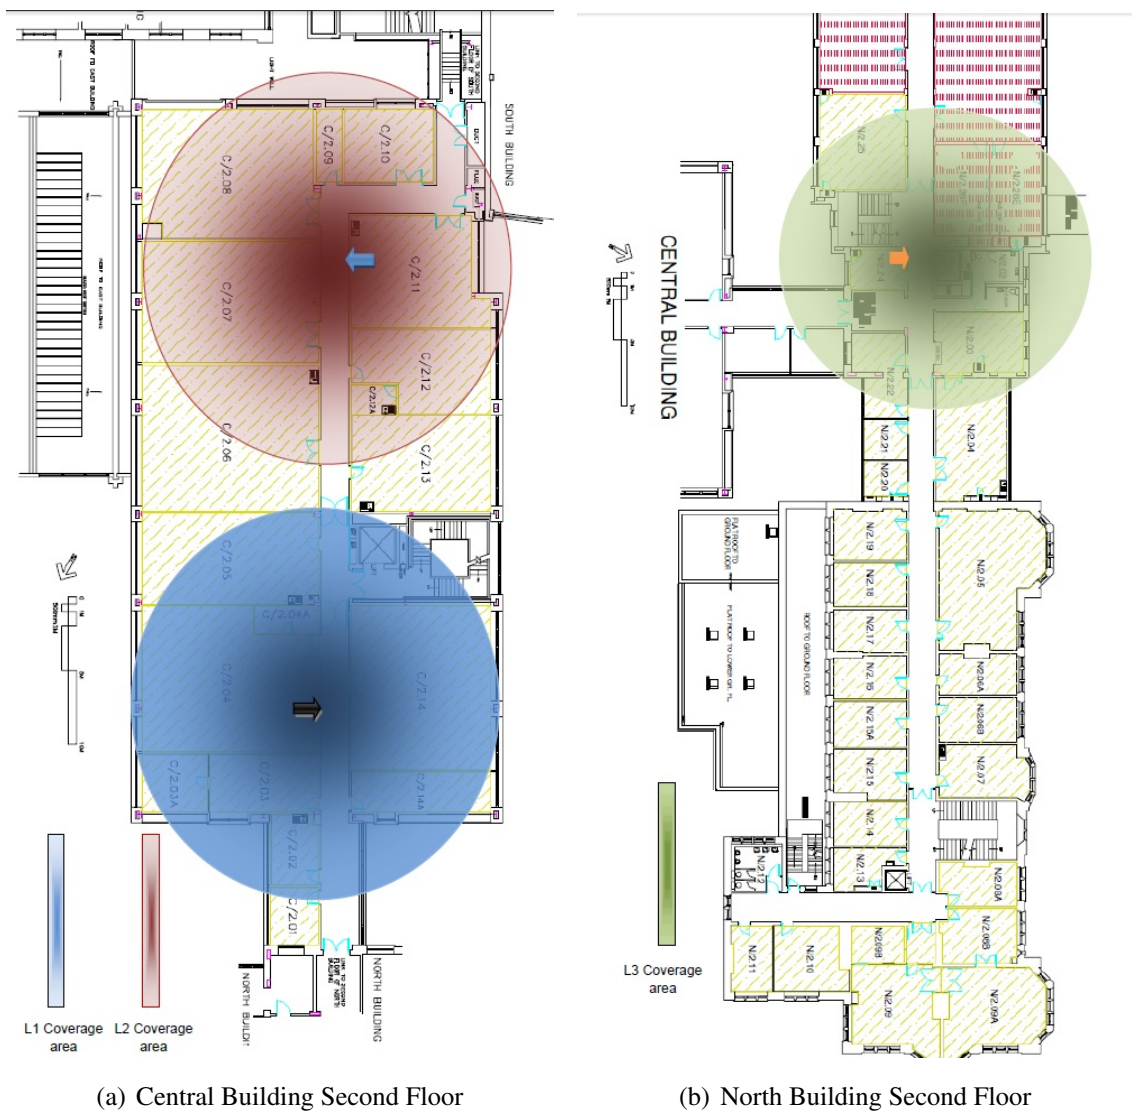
Bluetooth Footprint for Central Building & North Building Second Floor.
